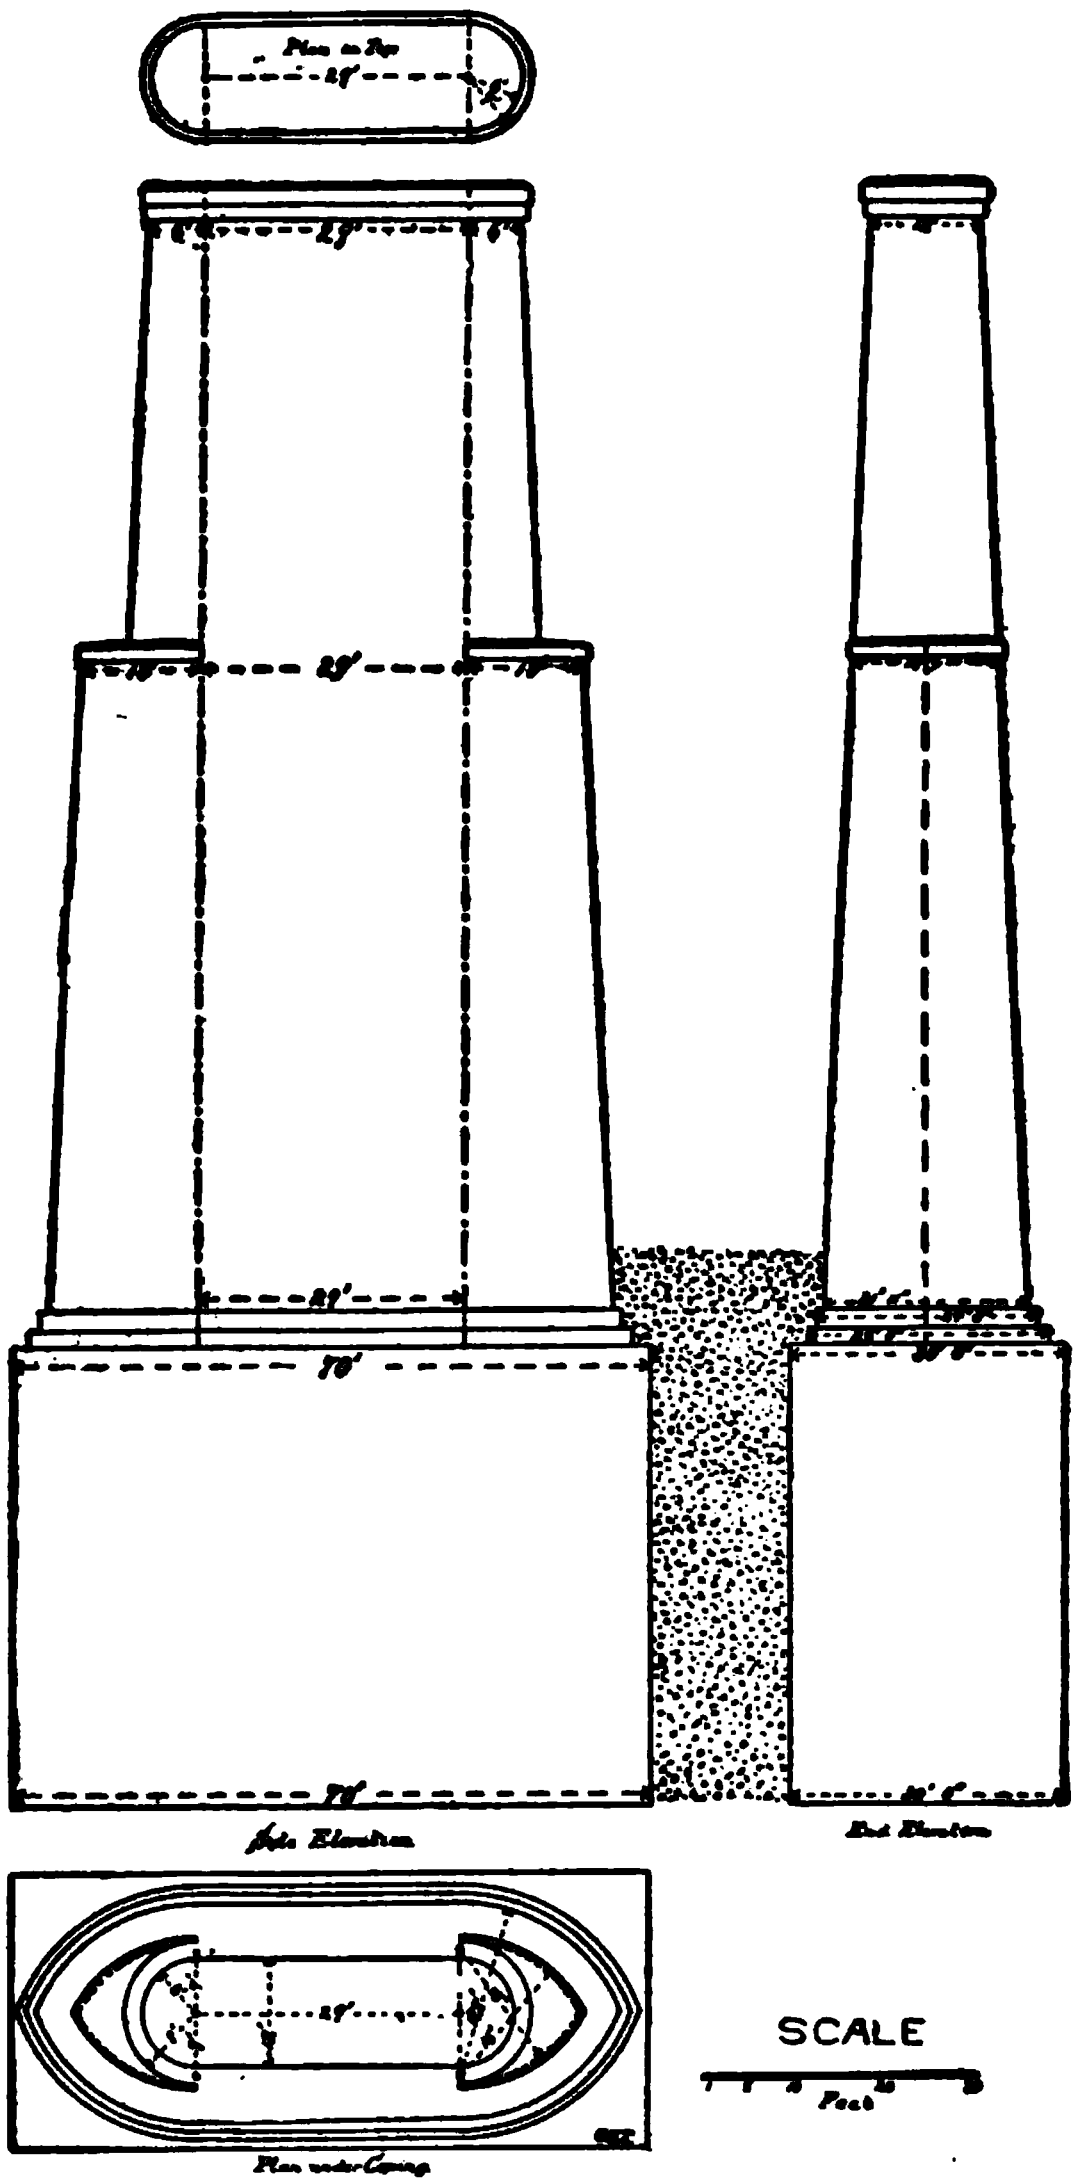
CHANNEL PIER, CAIRO BRIDGE.
